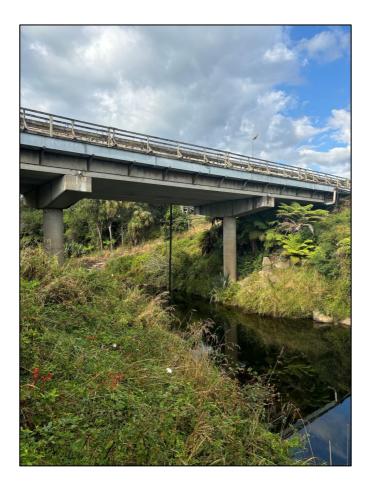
Mill Bridge, showing footings and road approach located on public
